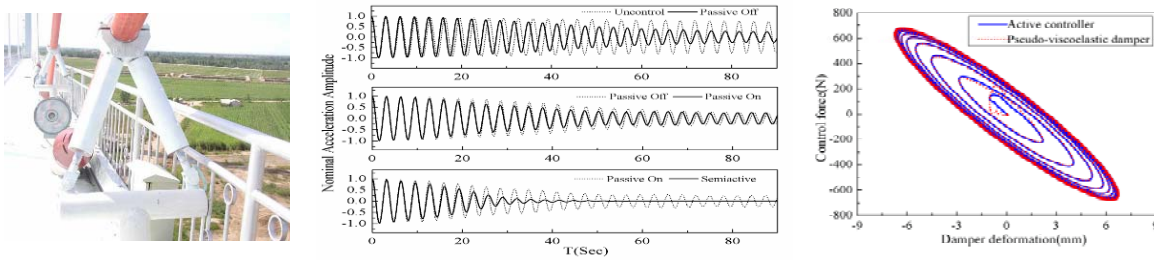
Applications and in-situ test of MR dampers in a cable-stayed bridge
